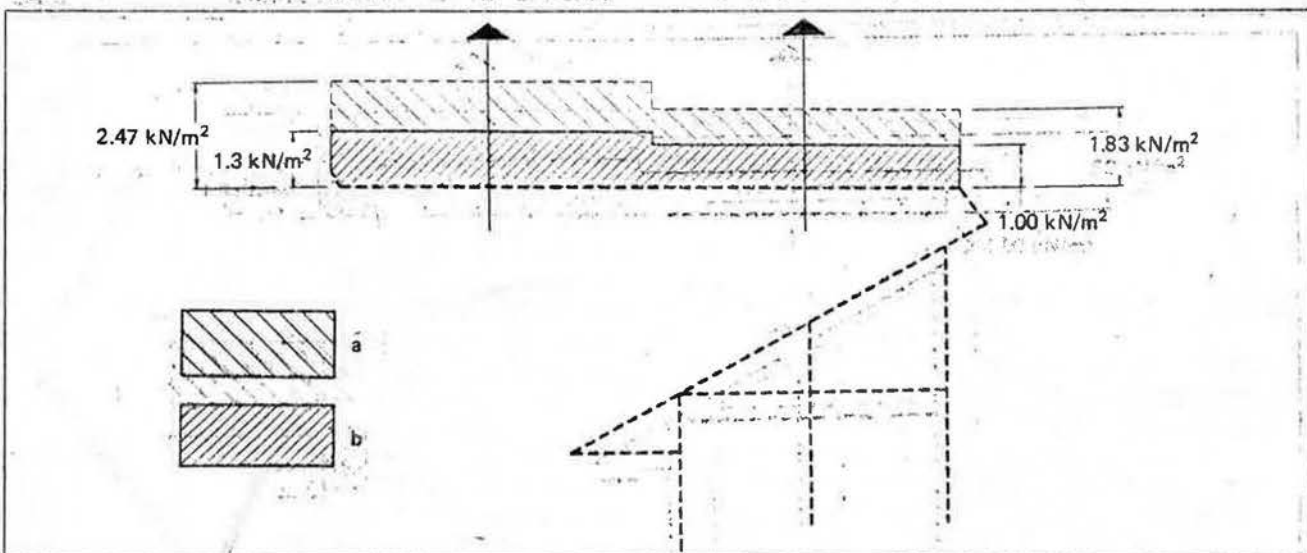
Static design wind pressures on roof, class C structure (East stand at Murrayfield). Key: (a) static design wind pressure determined in accordance with CP3, Chapter V, Part 2 and the BRE wind loading handbook for roof uplift condition; (b) static design wind pressure determined from BRE wind tunnel tests for roof uplift condition.
